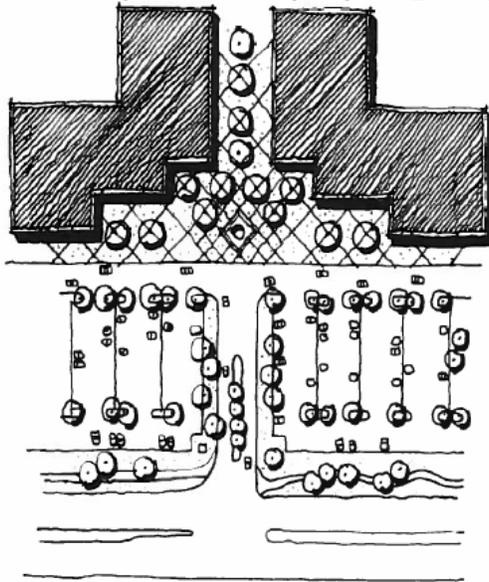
This development pattern uses buildings to frame an internal open space or plaza to give the center focus. Primary buildings orient to the plaza.
